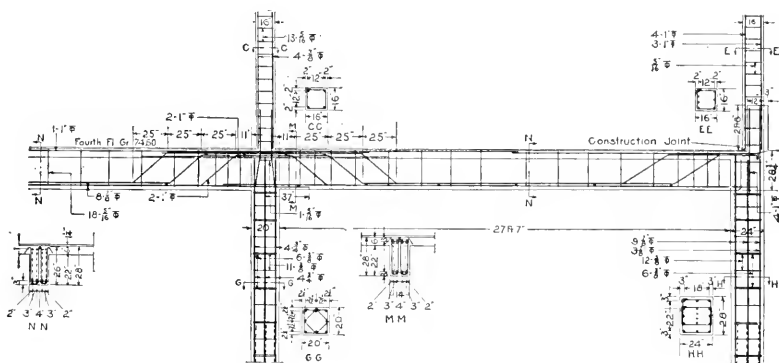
TYPICAL BEAM AND COLUMN ON MAJOR COURT.
